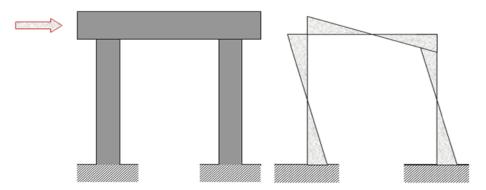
Moment Diagram of a Bridge Pier with Fixed Connections
